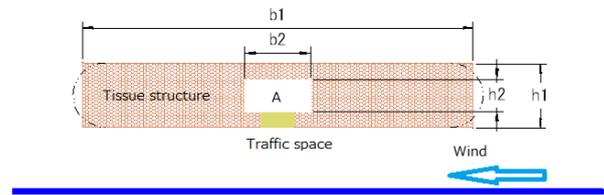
Cross section of Honshu-Hokkaido Bridge.
